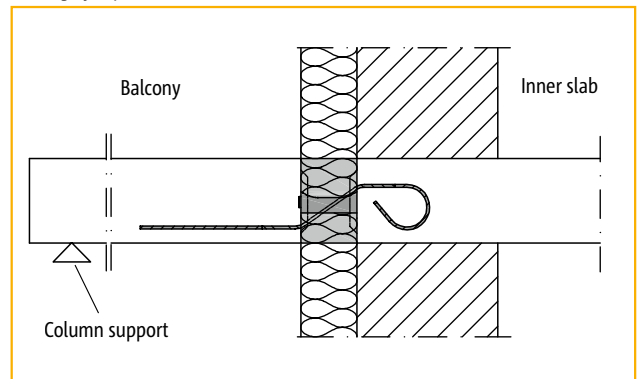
Brickwork with external insulation and a balcony at inner slab level
